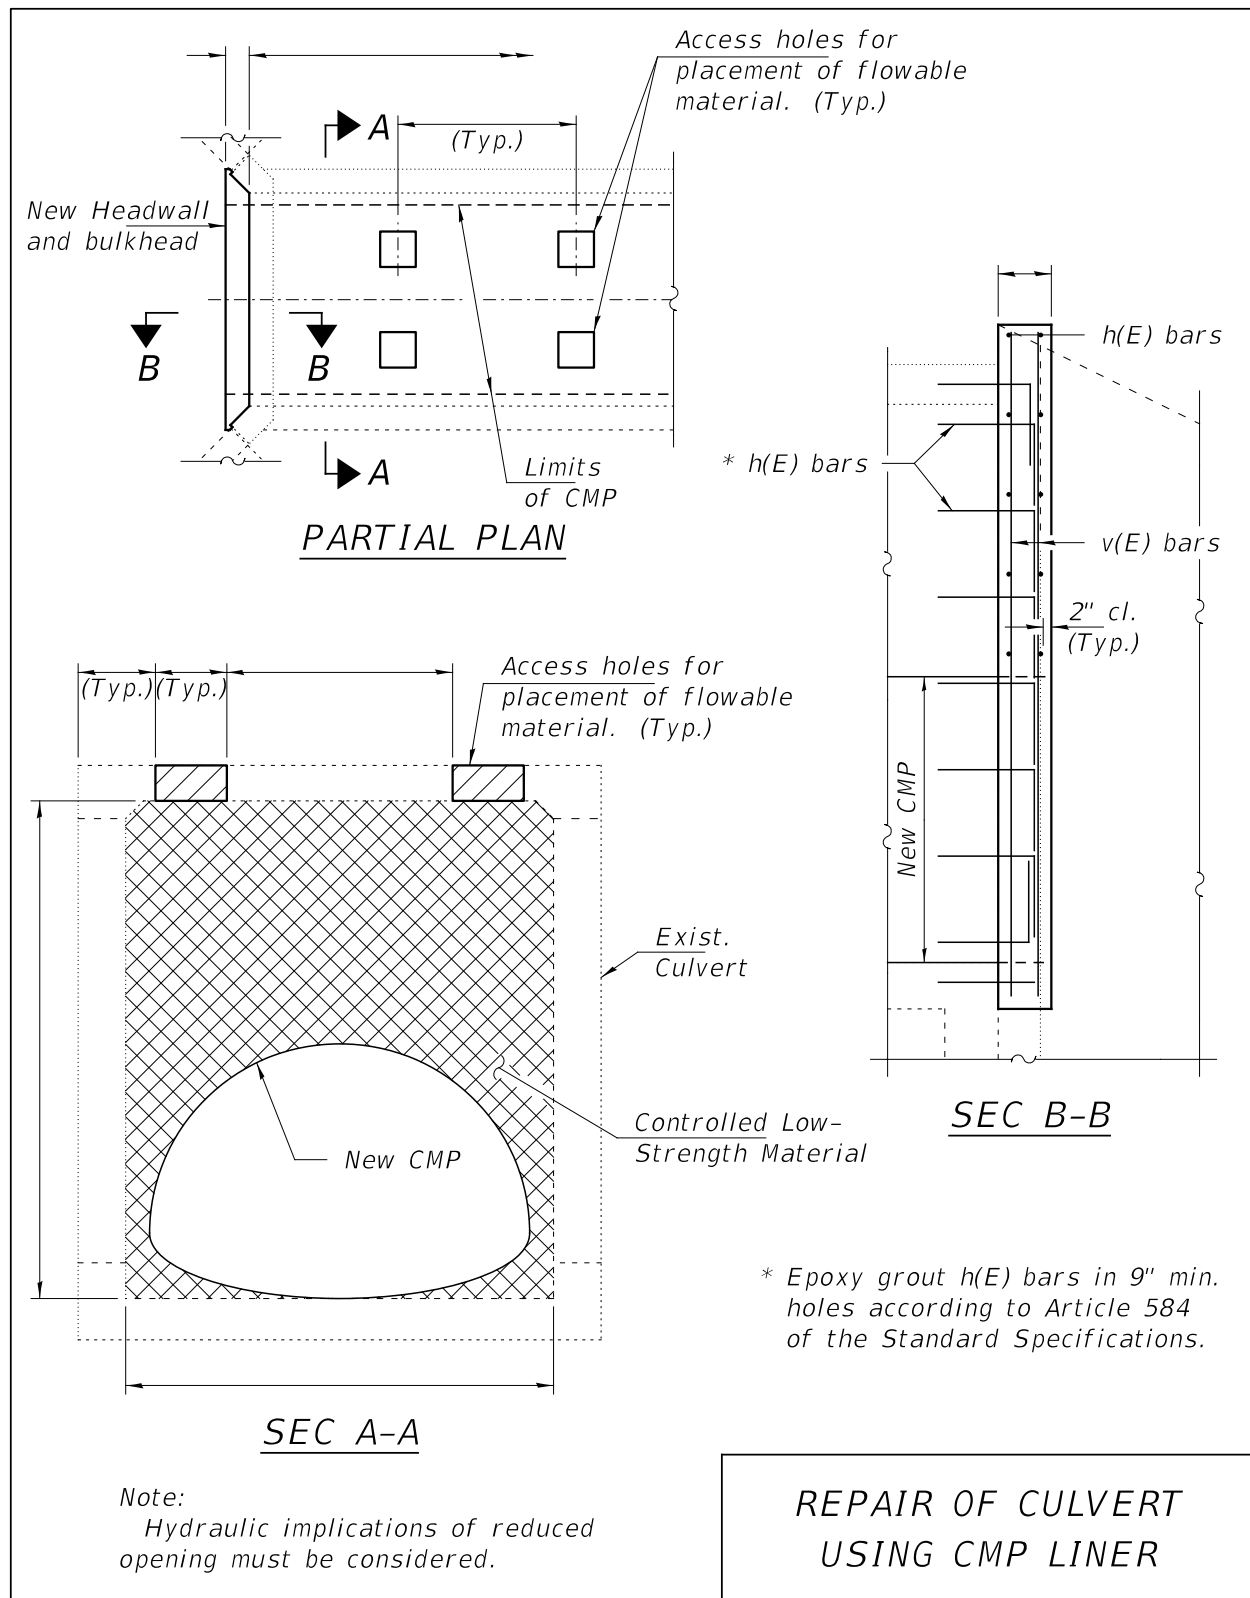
Repair of Culvert Using CMP Liner
